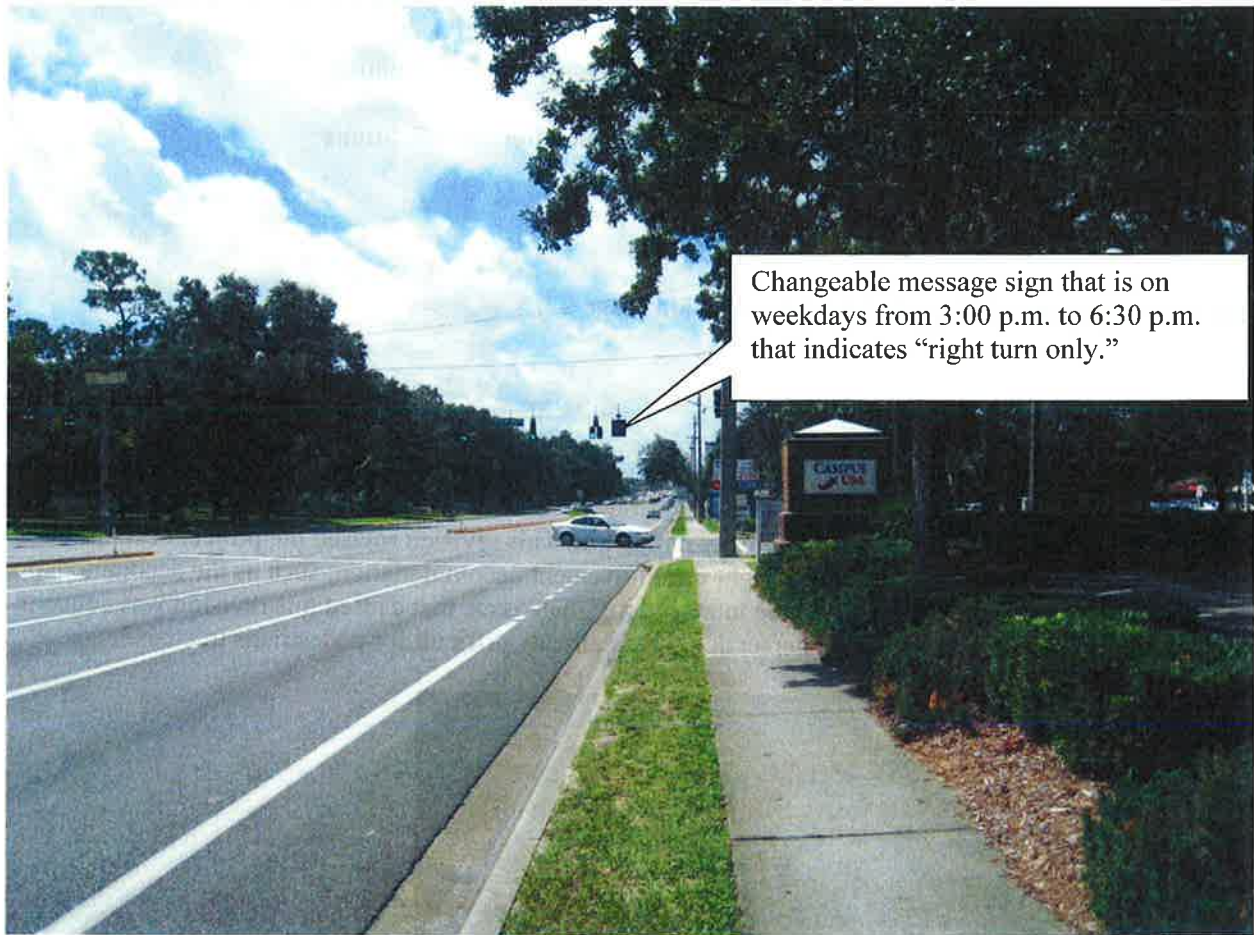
SW 34th Street at SW 20th Avenue (southbound)
